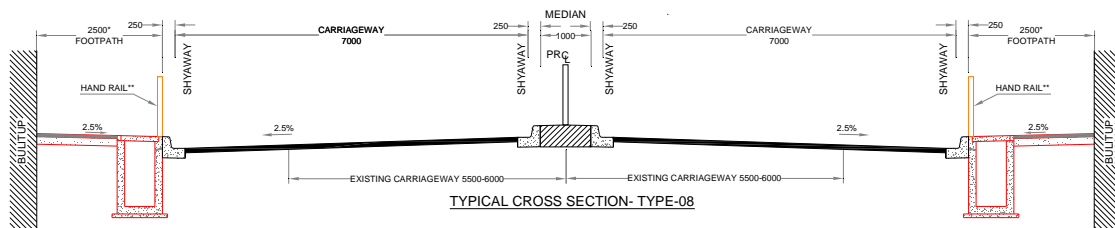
TYPICAL CROSS SECTION- TYPE-8
